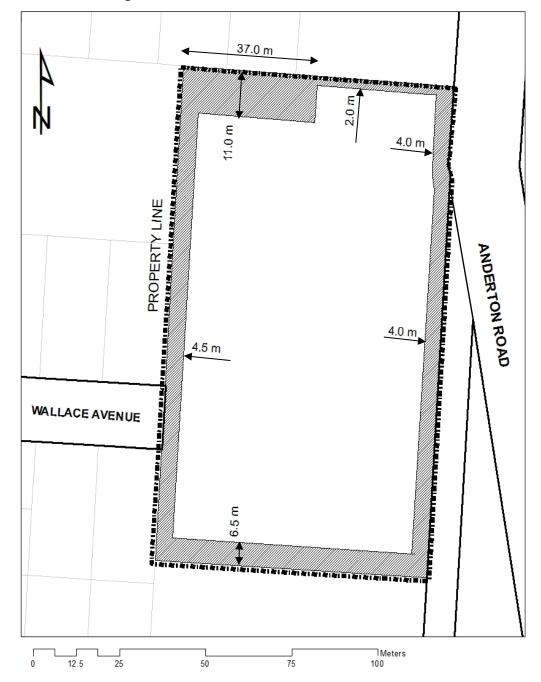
Lot 2 Plan 43630 - All Other Setbacks
